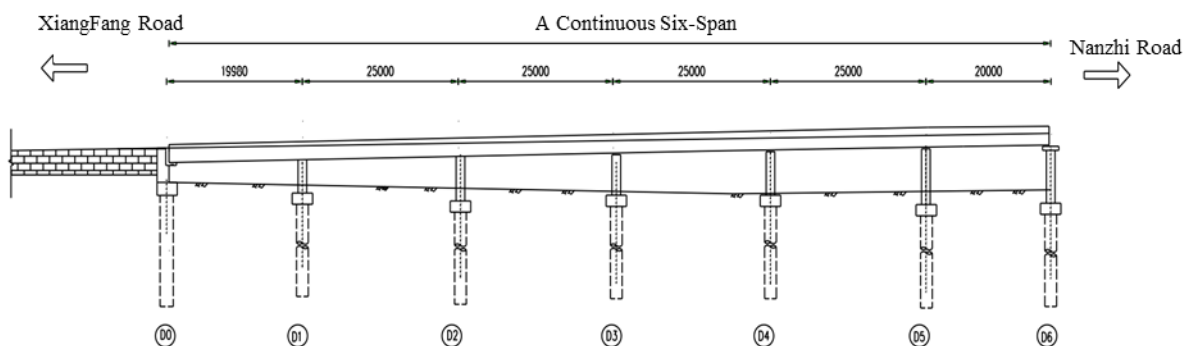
Bridge elevation layout diagram (unite: mm)
